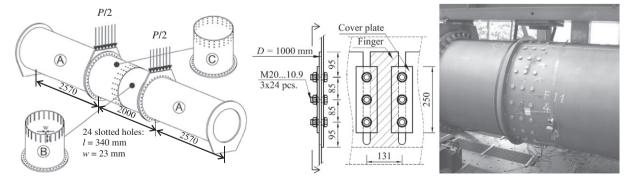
Specimen of 4-point bending test set-up and detail of friction connection.
